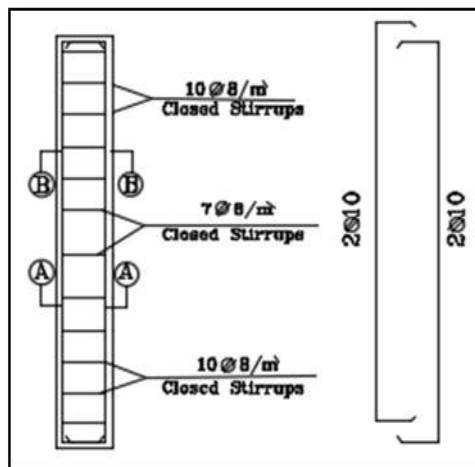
Reinforcement Details for Axially Loaded Columns (NC1, UHPC1 and COMC1)
